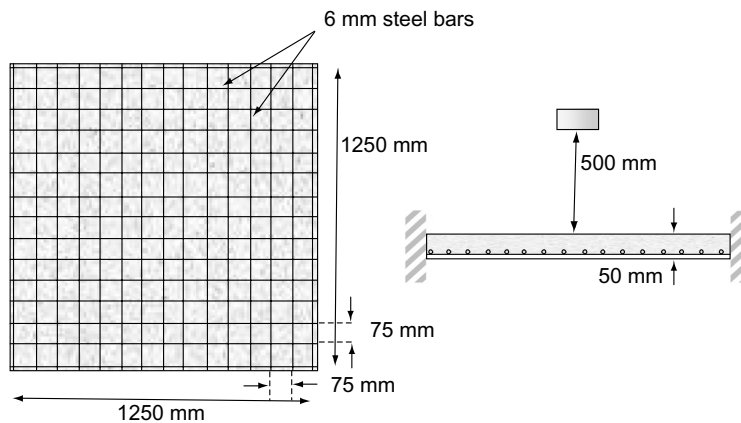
Reinforced concrete slabs under blast load at different standoff distances (41)
